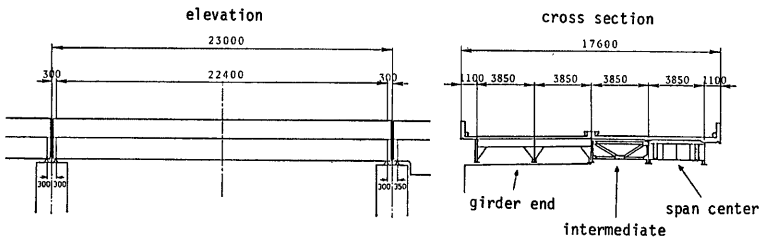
Prototype girder. (Hanshin Expressway, Sumiyoshi Section 2, Girder No. 4)
